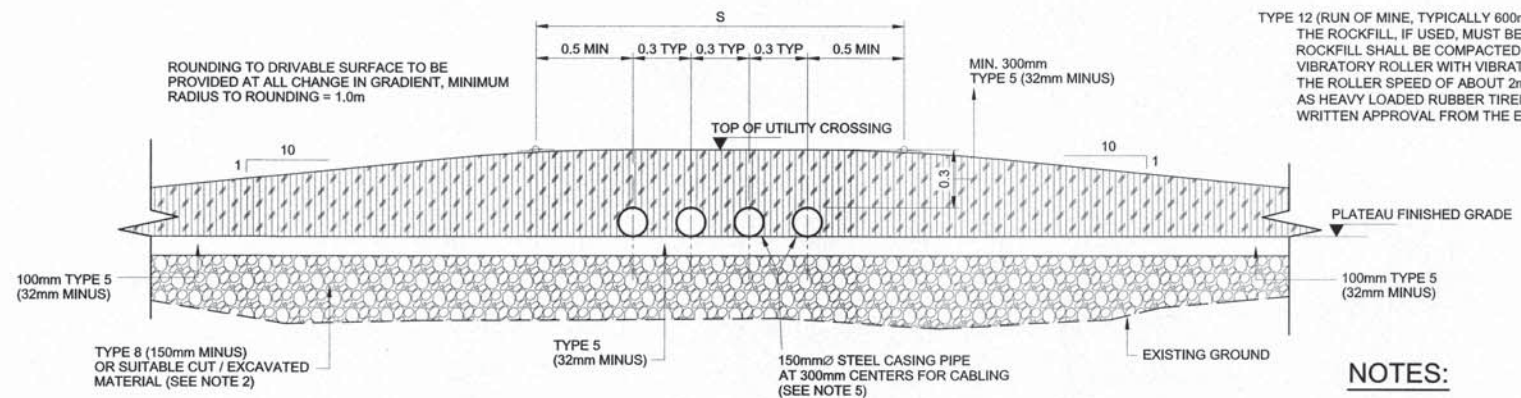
CABLE AND PIPE CASING UNDER DRIVABLE SURFACE
